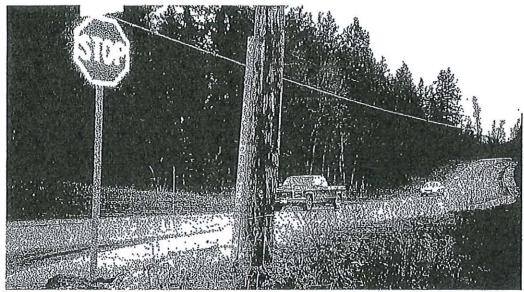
11<sup>TH</sup> STREET SE AND OKANAGAN AVENUE E LOOKING EAST View from 11<sup>th</sup> Street SE looking east while stopped and waiting to enter Okanagan Avenue E. Good sight lines are available to see oncoming vehicles.
